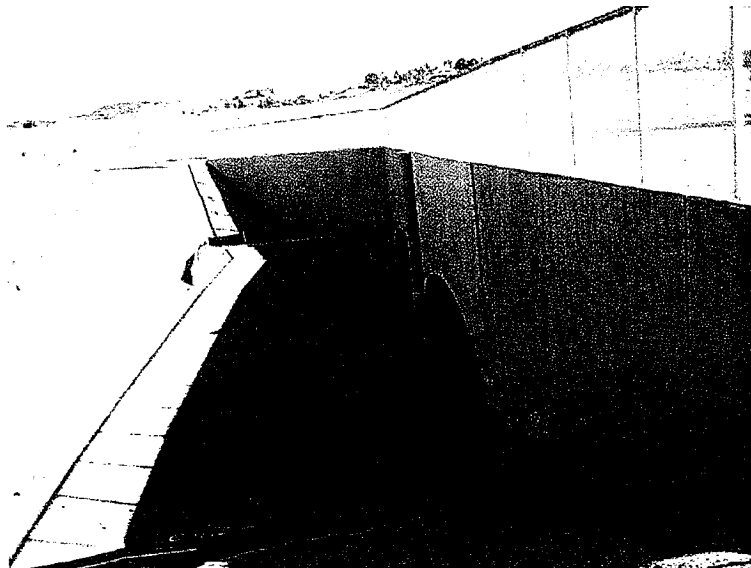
Loop Road bridge downstream. Riprap is not installed yet.
